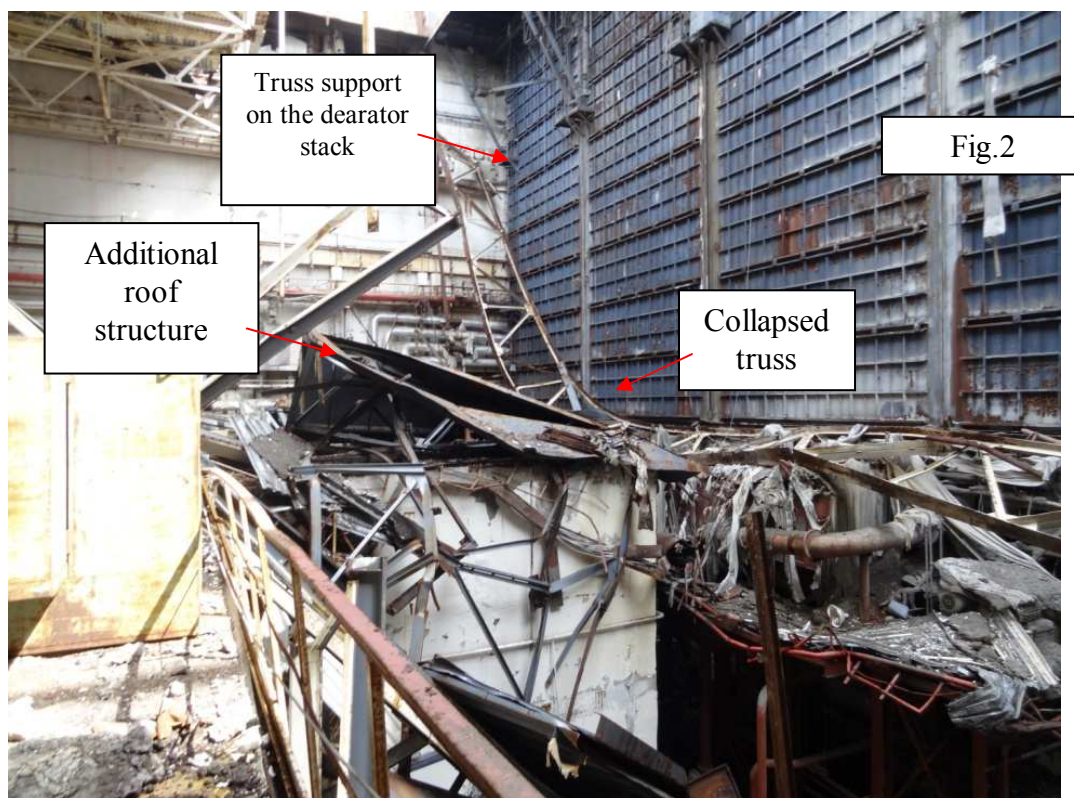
Turbine Building inside view of main floor area under collapsed roof section
